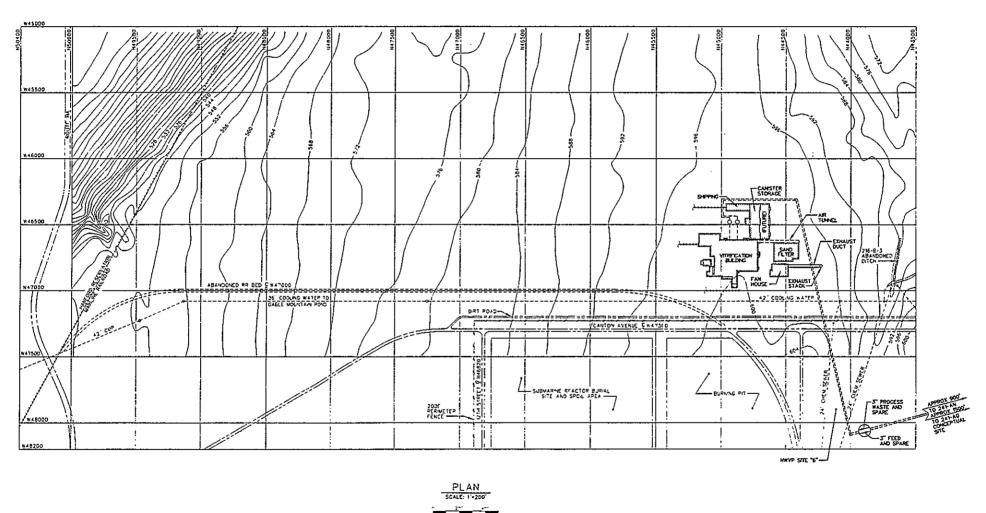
Civil Hanford Waste Vitrification Plant Site 5.
